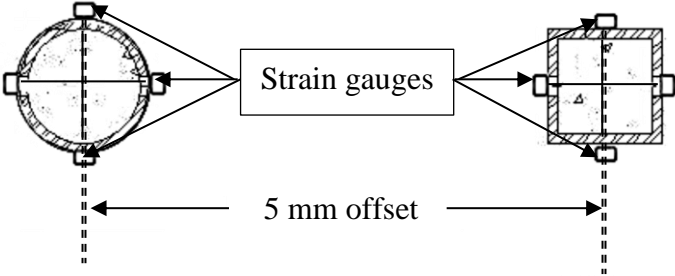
Section A-A: CFS cross-section of column showing locations of strain gauges around perimeter.
